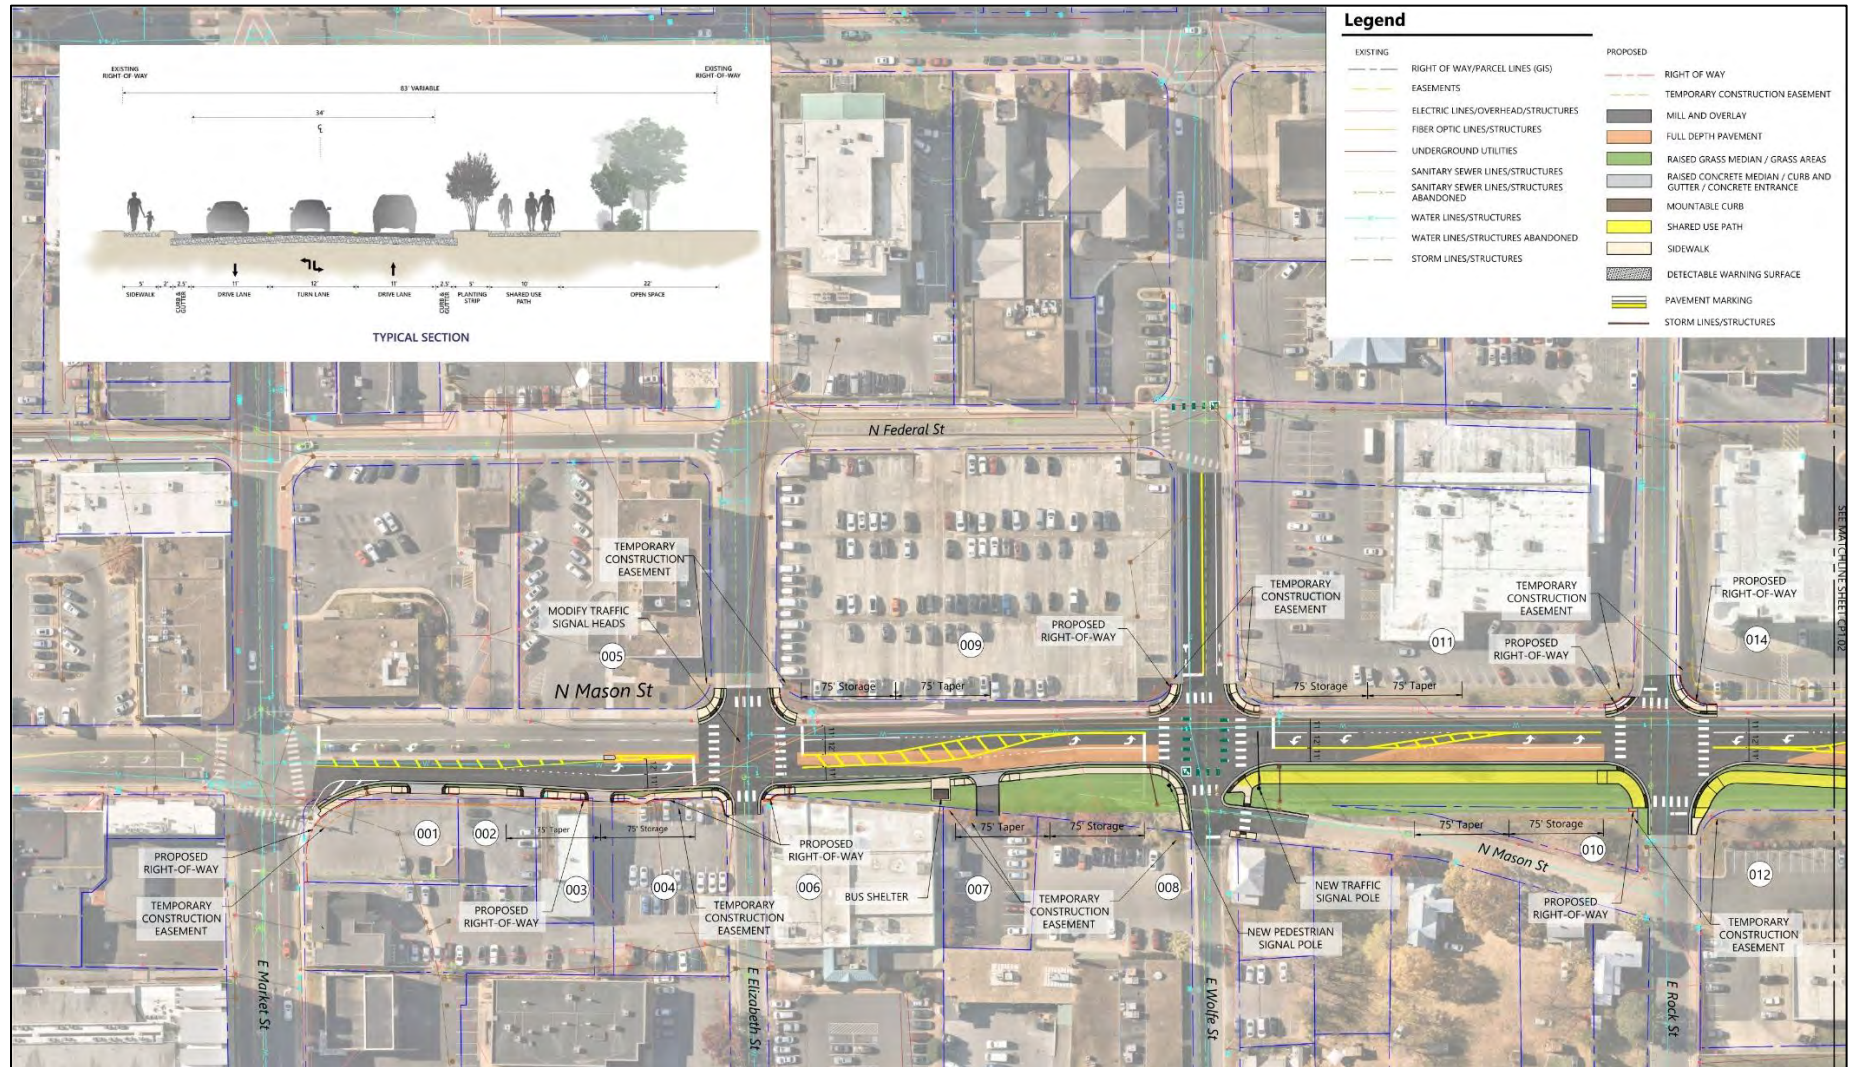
Preferred Alternative Design Sketch, Sheet 1 (E Market Street to E Rock Street)
